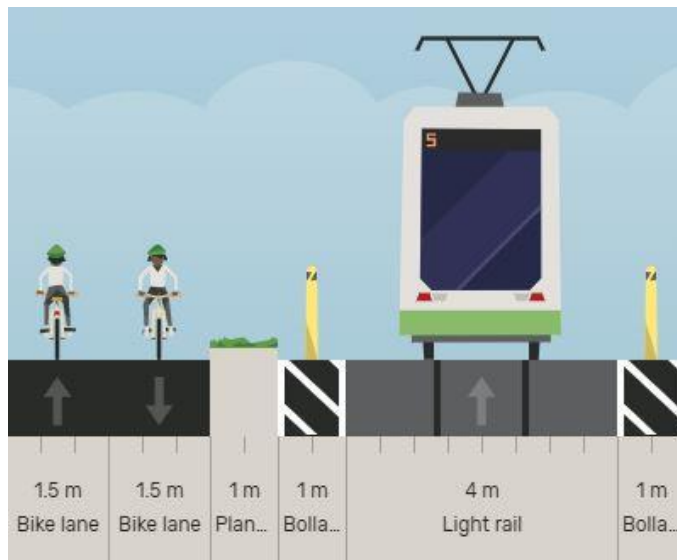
Indicative cross section light rail (10m single carriageway)
